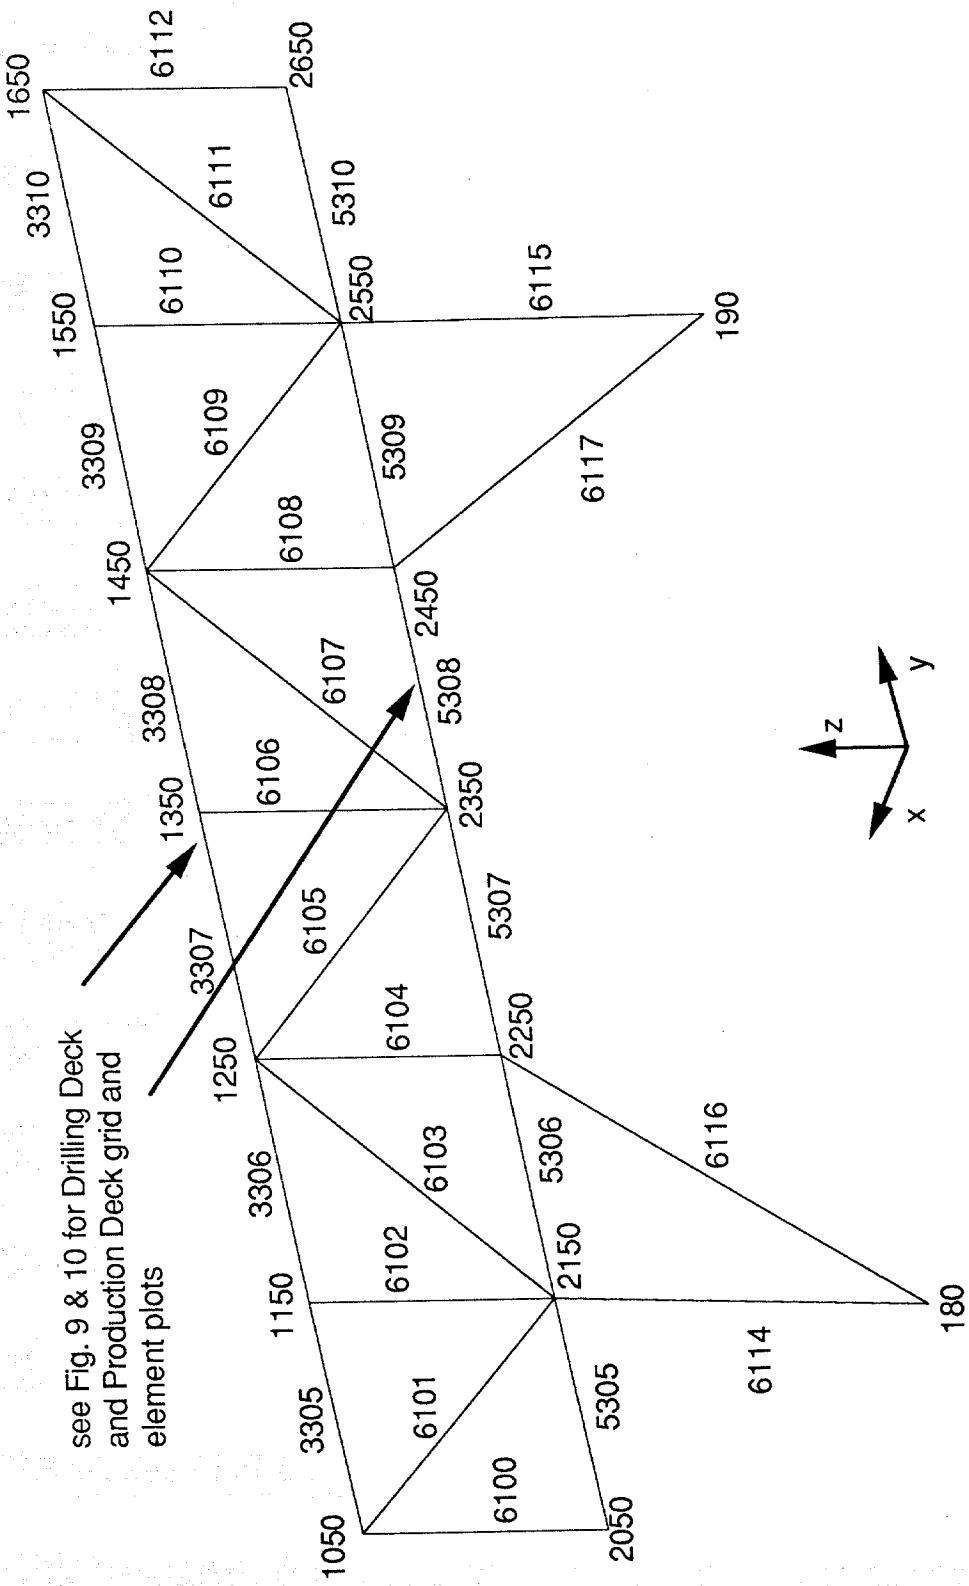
Row 1 Elevation Element and Grid Point Numbers
